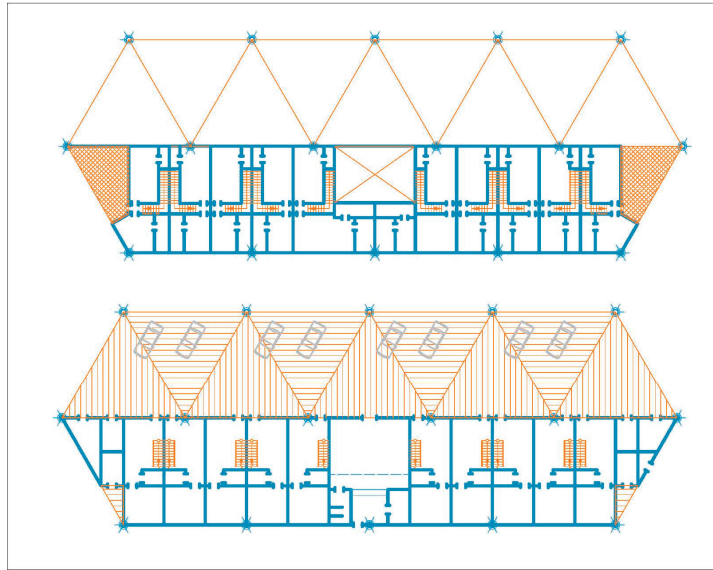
Planning solutions: the Highly comfortable motel (10 apartments) with parking under a canopy—1st, 2nd floors.
